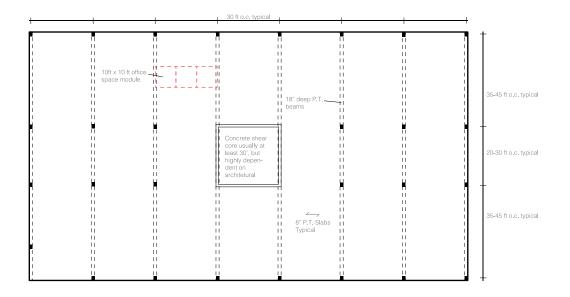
Typical Office Building Based on Big Tech 10'x10' office space Module. Floor footprint is equal to 210'x 120'.
